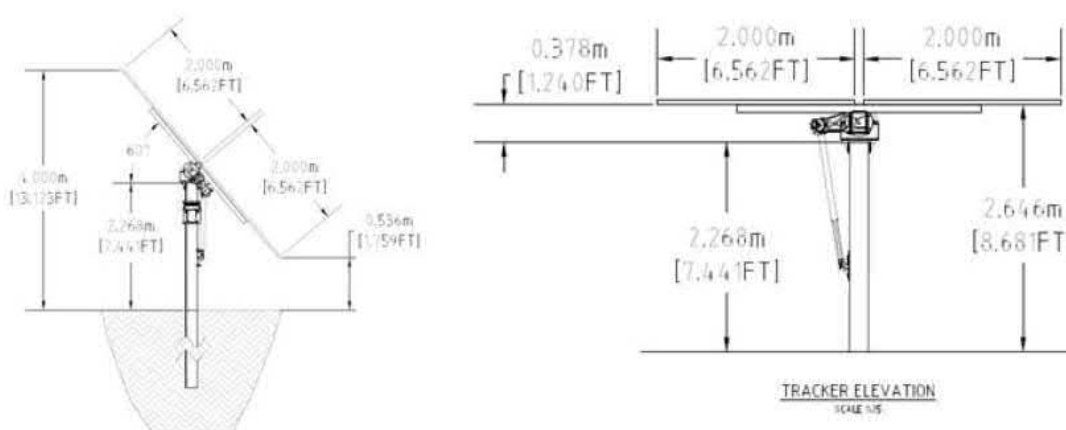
Tracking System Elevation. Not to scale. Source: NG Electrical Plans (Dated 22.06.2020)
